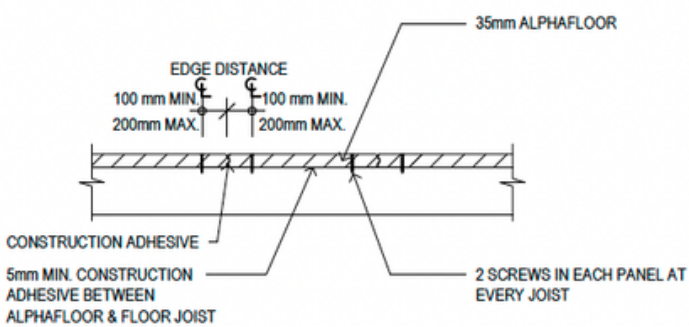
ALPHAFLOOR® FIXING TO TIMBER JOISTS
